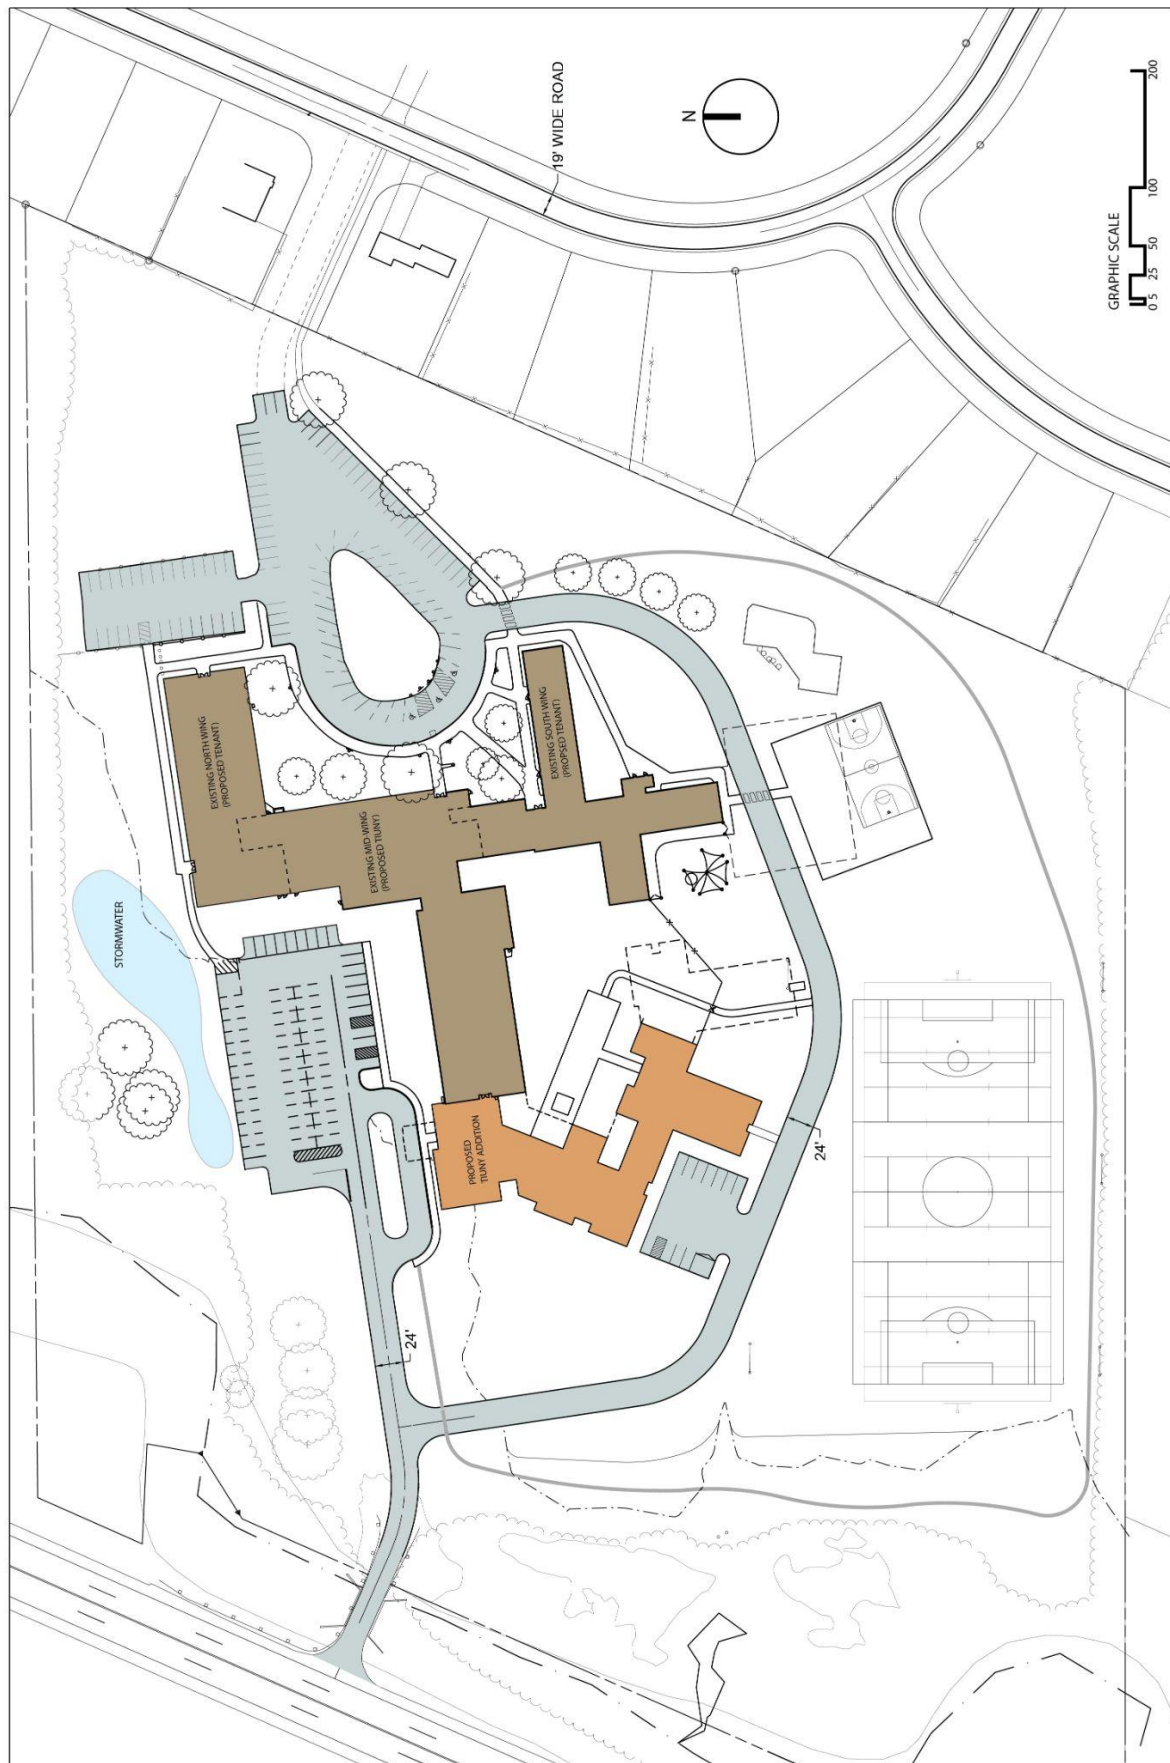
Proposal to close the Idlewood vehicle entrance and add a connecting driveway to the south of the building
